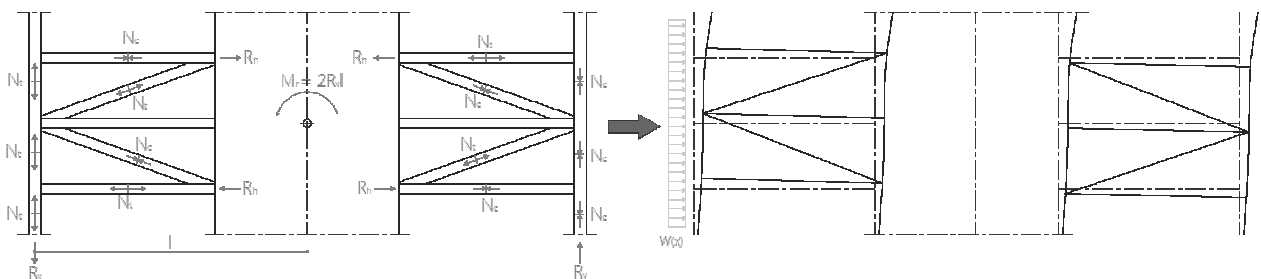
; a) Structural actions in outrigger members due to lateral wind loading b) Deformed shape outriggers
